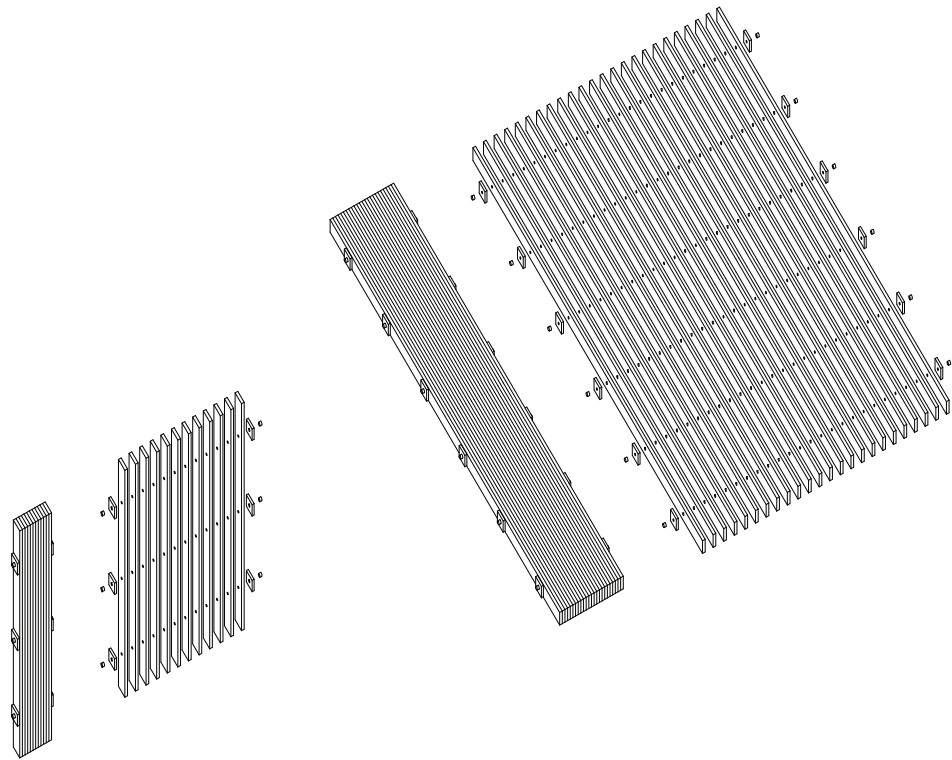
Drawings of a straight stress-laminated floor panel or deck and a new type of straight stress-laminated column.
